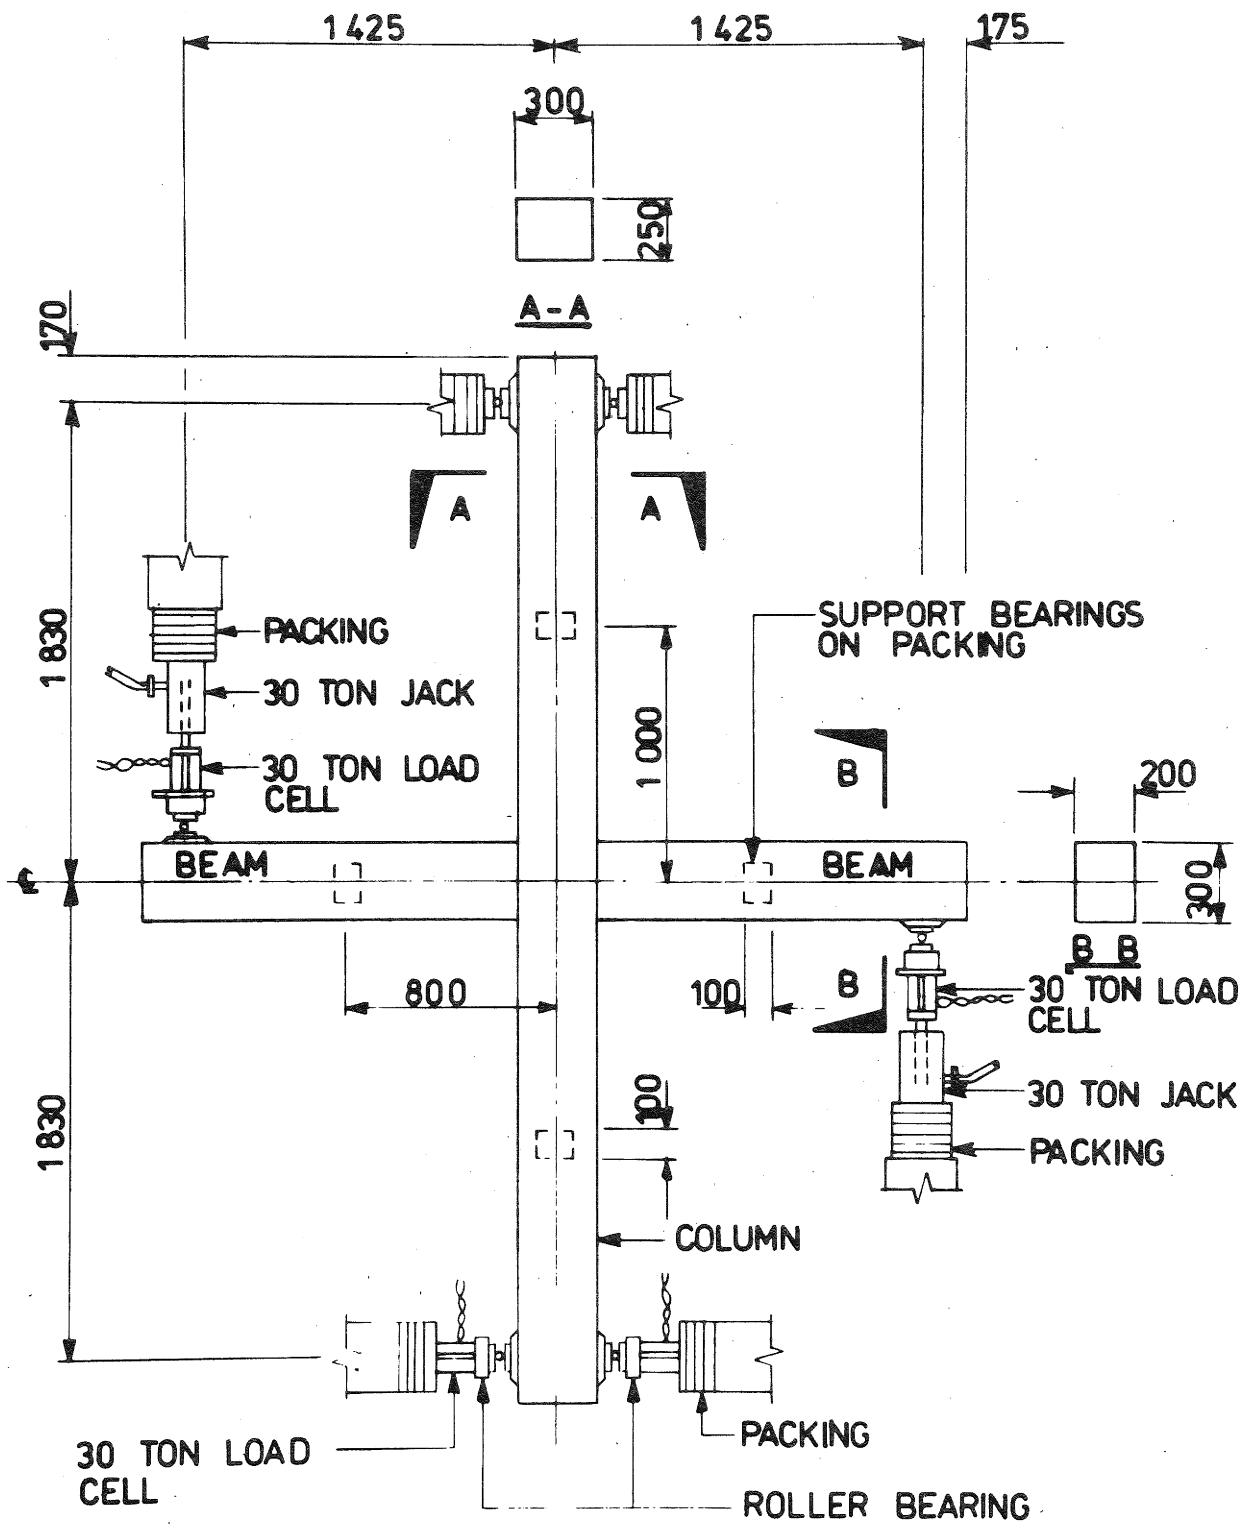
PLAN VIEW OF TEST ARRANGEMENT FOR BEAM-COLUMN JUNCTION SPECIMENS.
